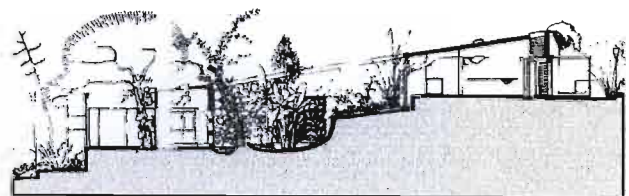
B. Biermann – House Biermann (1961). Section.
